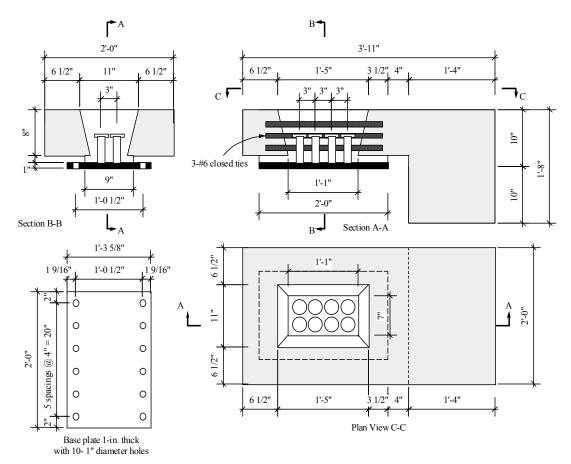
Concrete Dimensions of the eight-stud, closed-ties confinement specimen
